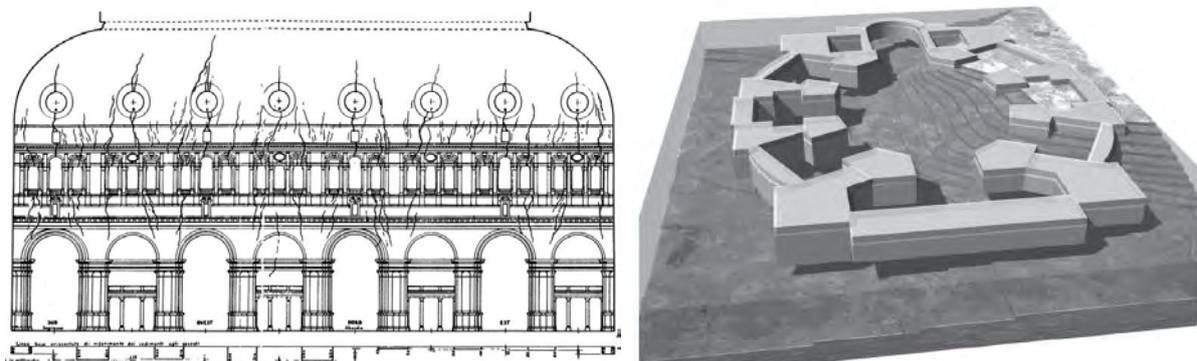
Cracking pattern on the dome (left side) and axonometric view of the foundations (right side).
